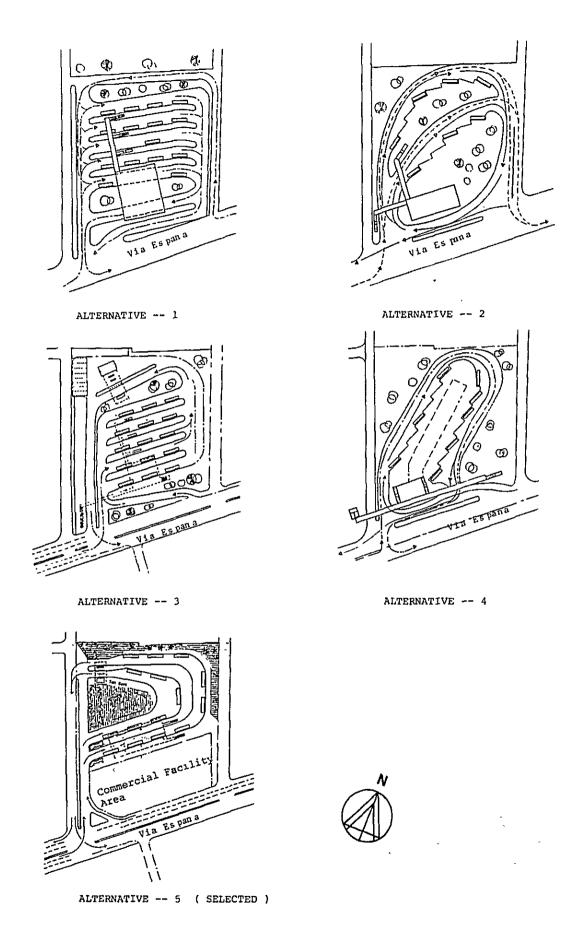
ALTERNATIVE PLANS FOR CHANIS BUS CENTER
